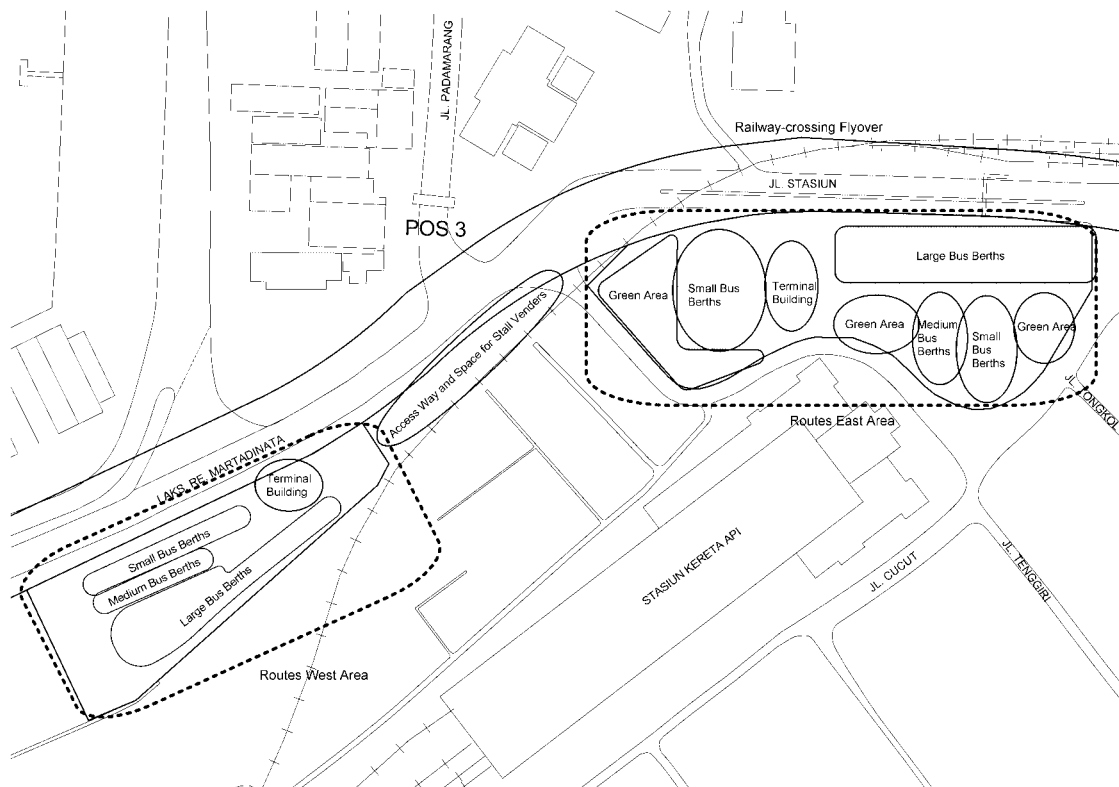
B-10 Proposed Spatial Structure for the Alternative-2
